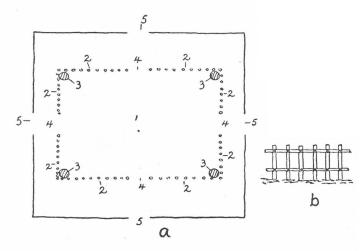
Interior arrangement of house: a, ground plan; b, detail of fence (apaapa). 1, inner sleeping division; 2, fence formed of uprights 2 feet to 2 feet 3 inches high, some of which are driven into ground to act as posts, and two horizontal rods lashed to uprights; 3, supporting posts; 4, openings in fence; 5, doorways of house.
